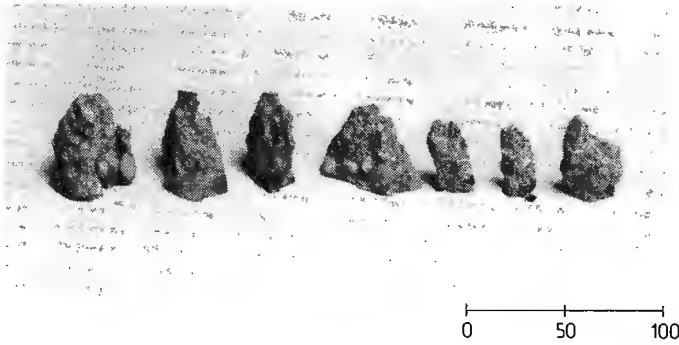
Cone-shaped rest-pieces of broken specimen 15A1-3.
